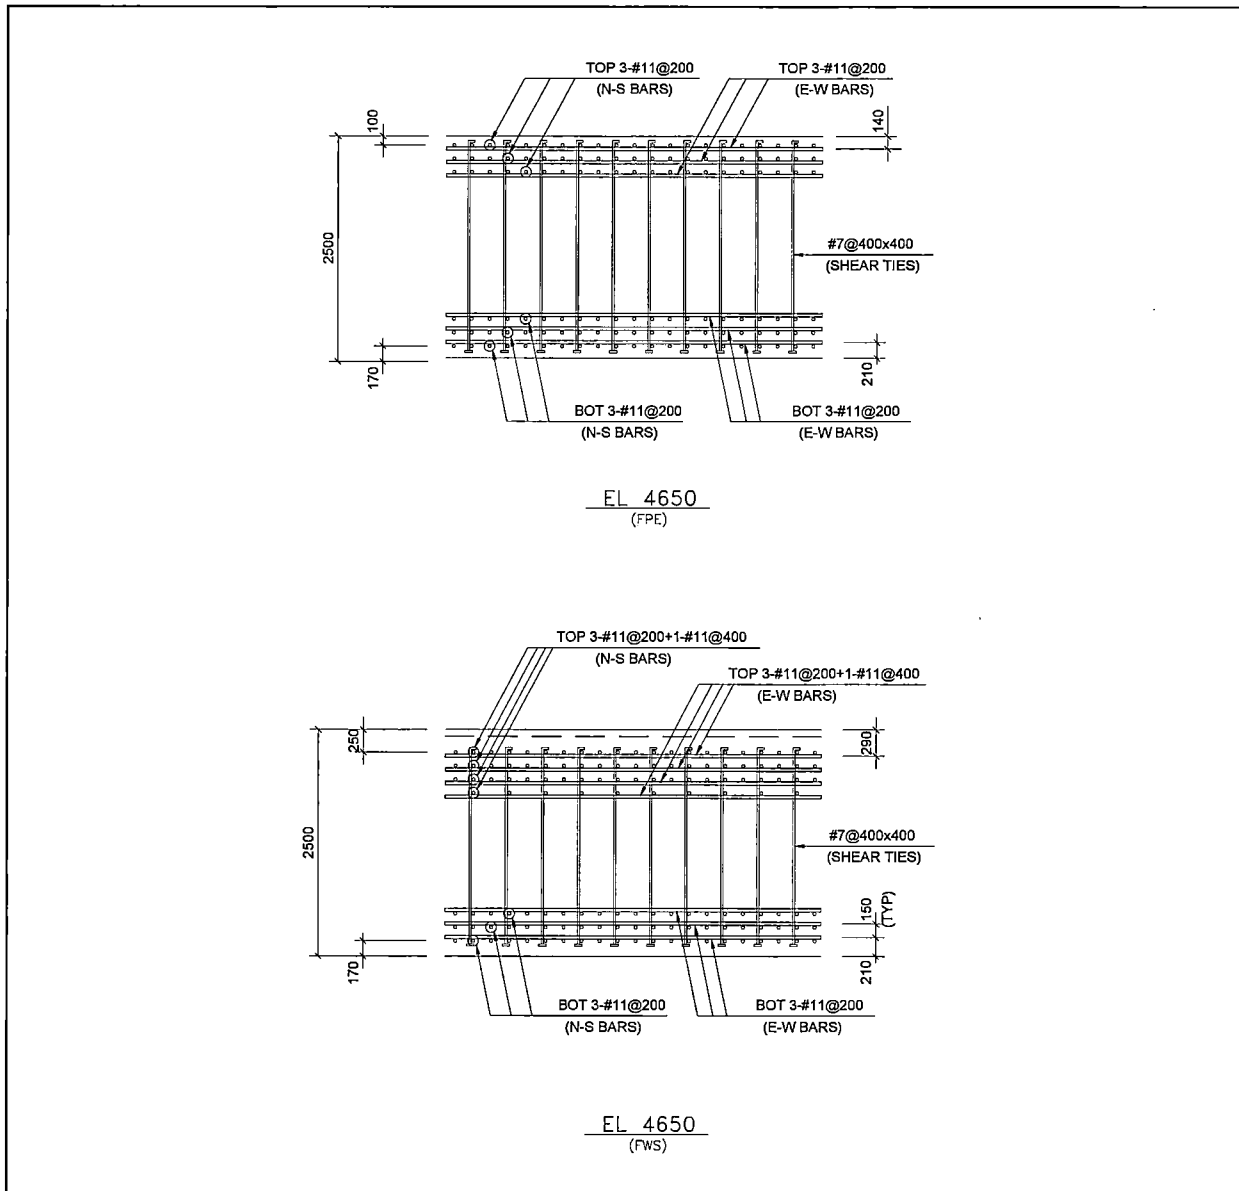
Typical Basemat Rebar Arrangement (unit: mm)
